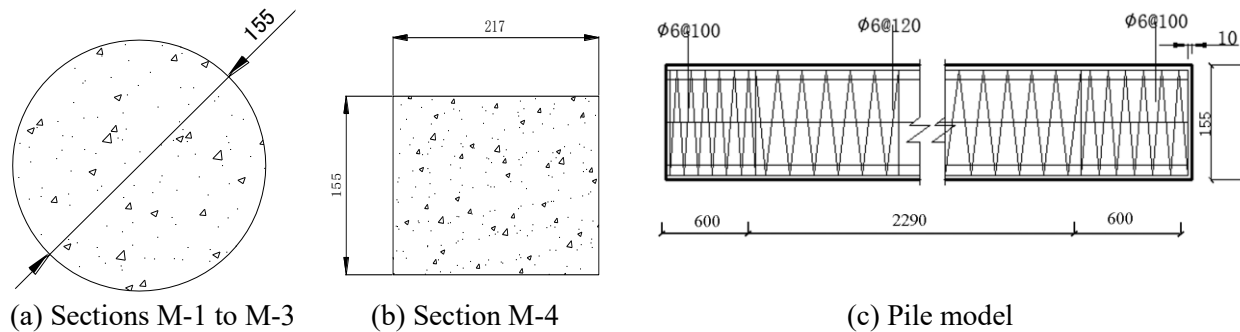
Pile section form and diagram of pile model (unit: mm)
